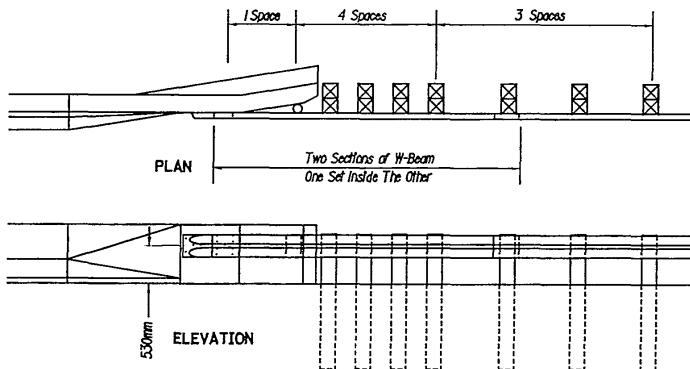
Flared Concrete Bridge Railing with W-Beam Approach Rail
